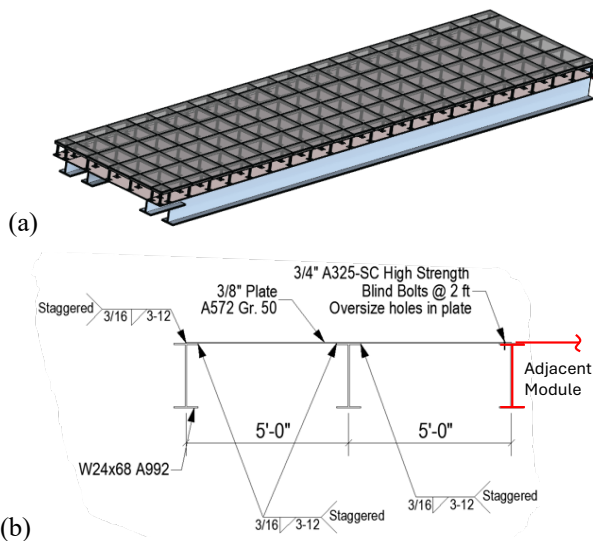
Current prototype module (a) isometric with raised access floor, (b) section of two beams and a plate, with asymmetric plate module shown
